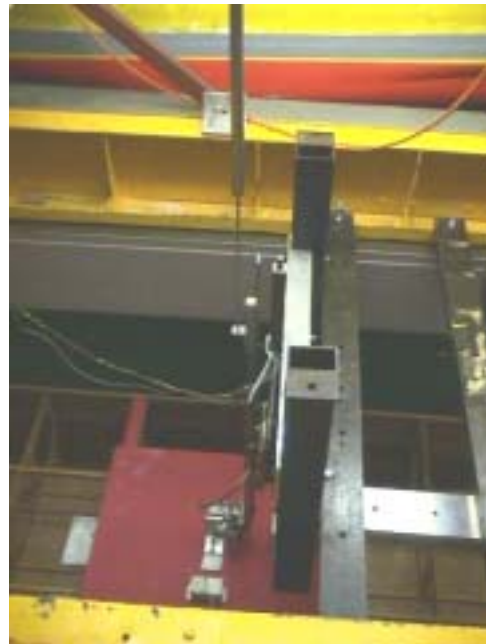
Photograph of the measuring equipment. From top to bottom: linear displacement probe, dynamometer and inclinometer.
